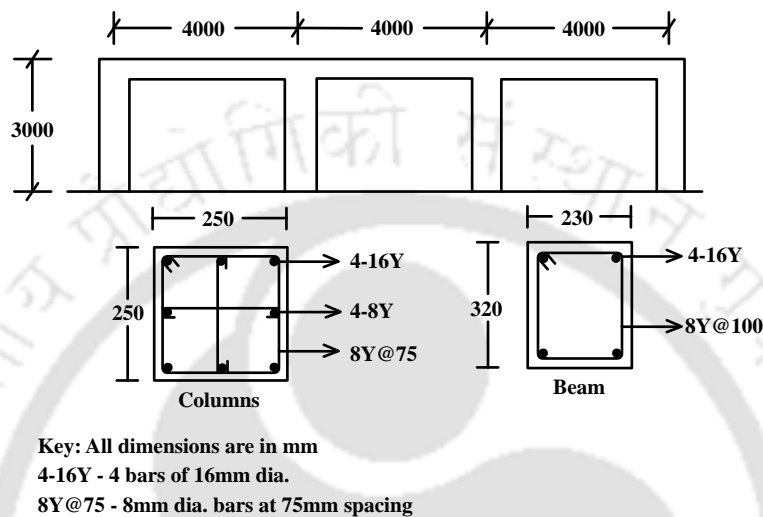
Geometry (not to scale) and sectional details of the 1-storey frame
